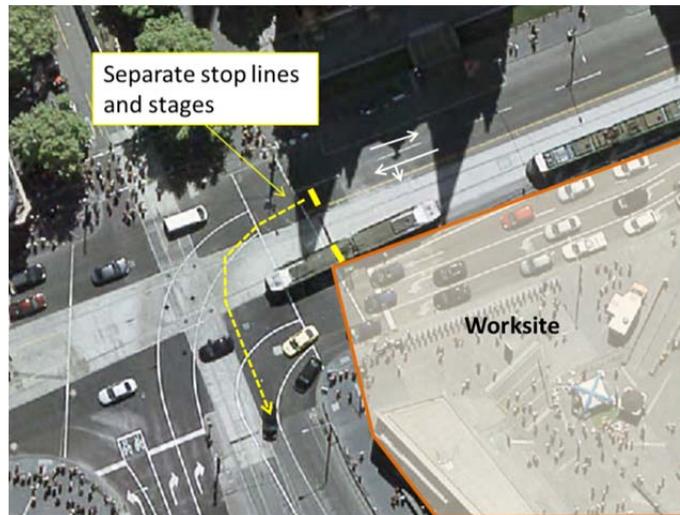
Sketch of potential Swanston St/Flinders Street layout
